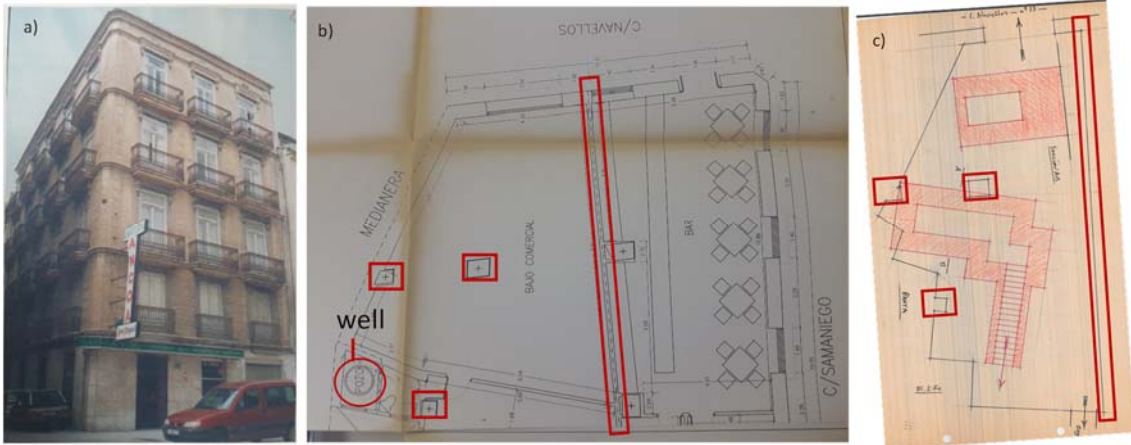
Building before the rehabilitation: a) façade b) ground floor plan (AHMV) c) Shelter SH5: plan (Rieta Collection)
